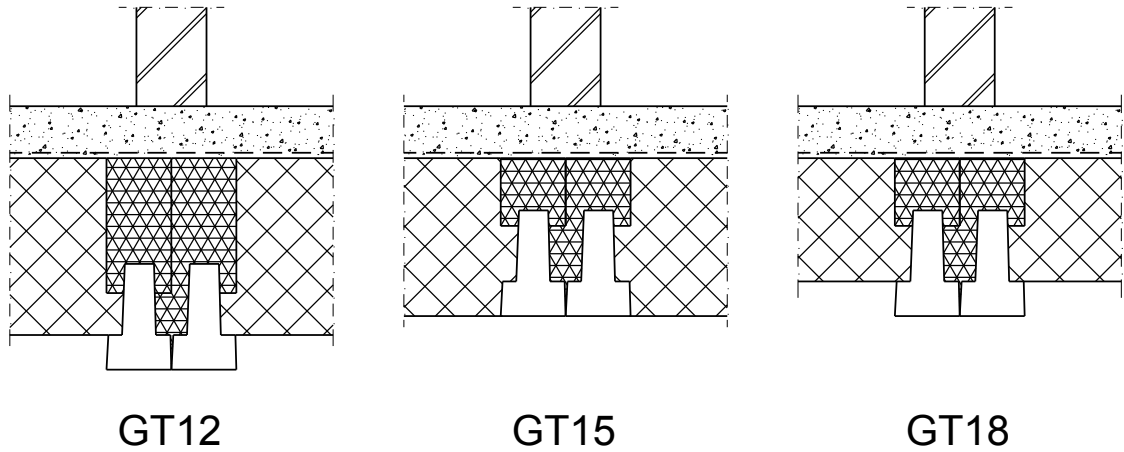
Examples of typical pre-cast concrete beams.  $H_w$  = Width of the beam header. All dimensions in mm.
